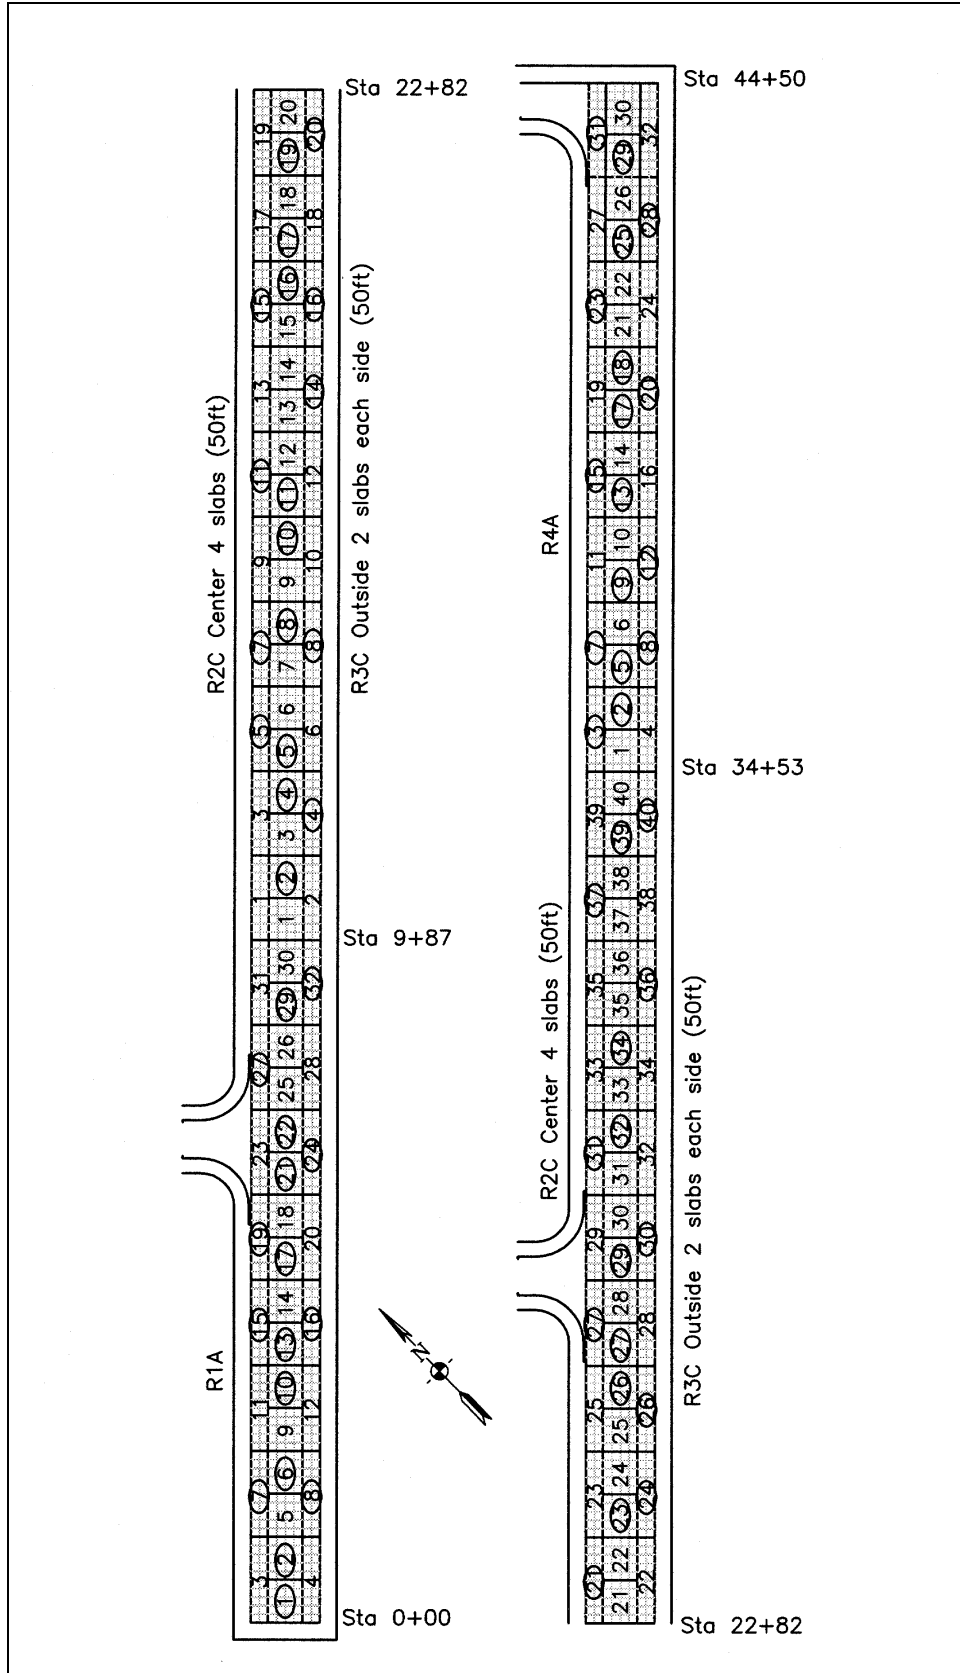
Sample unit layout, Runway 4-22, (R1A through R4A)
